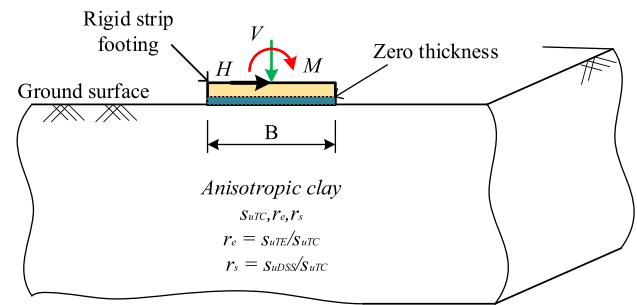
Problem definition for obtaining 3D failure envelope of a strip footing on anisotropic clay
